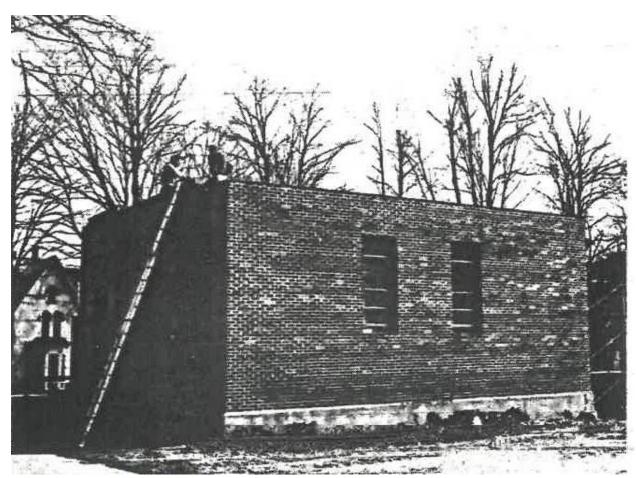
1970 Photograph showing the final steps of construction for the west elevation of the 1952 addition that had previously abutted the County Clerk's Office. The construction of this wall enclosed the 1952 addition and gave it its current appearance.
